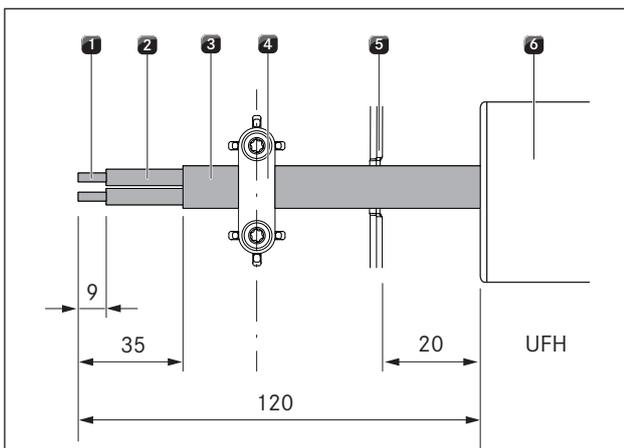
Stripping lengths and assembly position of the connection cable in the universal control unit
